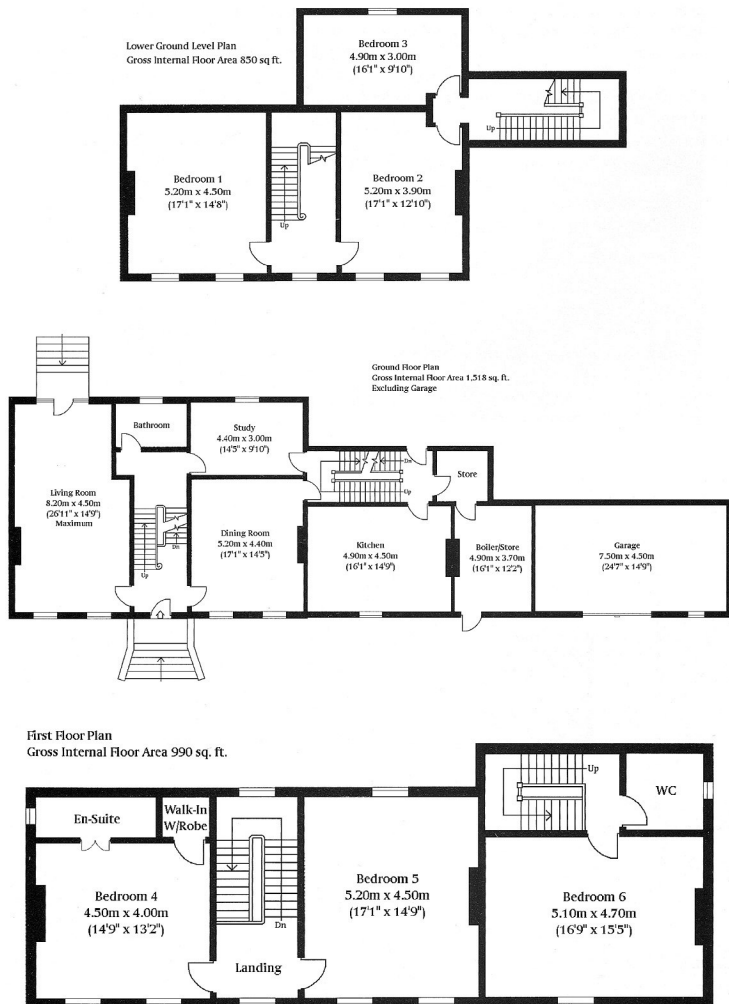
Floor plans of Queensborough House in 2005. For illustration purposes only (i.e., not to scale).
